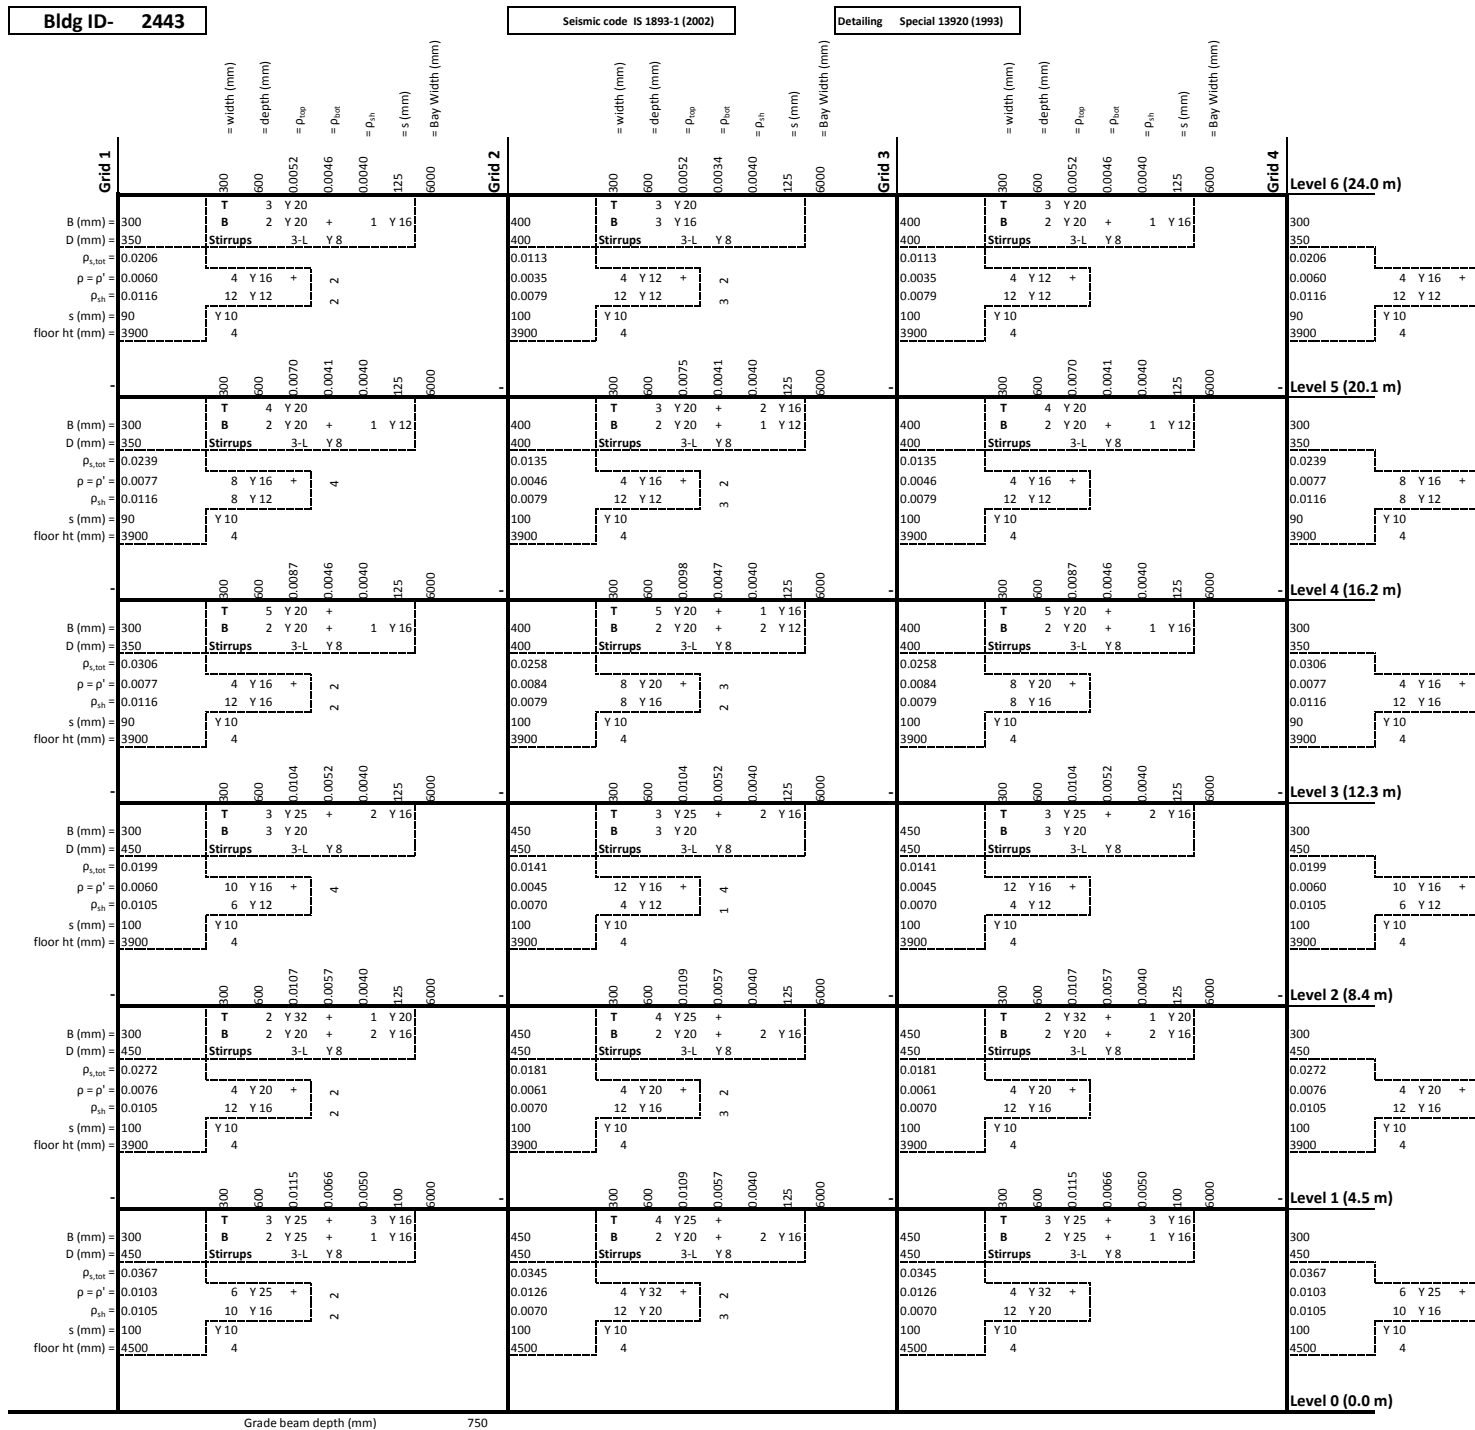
Provided reinforcement and modeling details for building ID 2443
